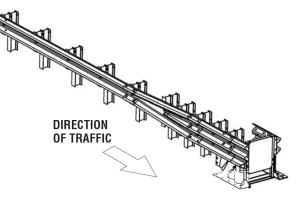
Thrie-Beam to W-Beam Connection Panel
